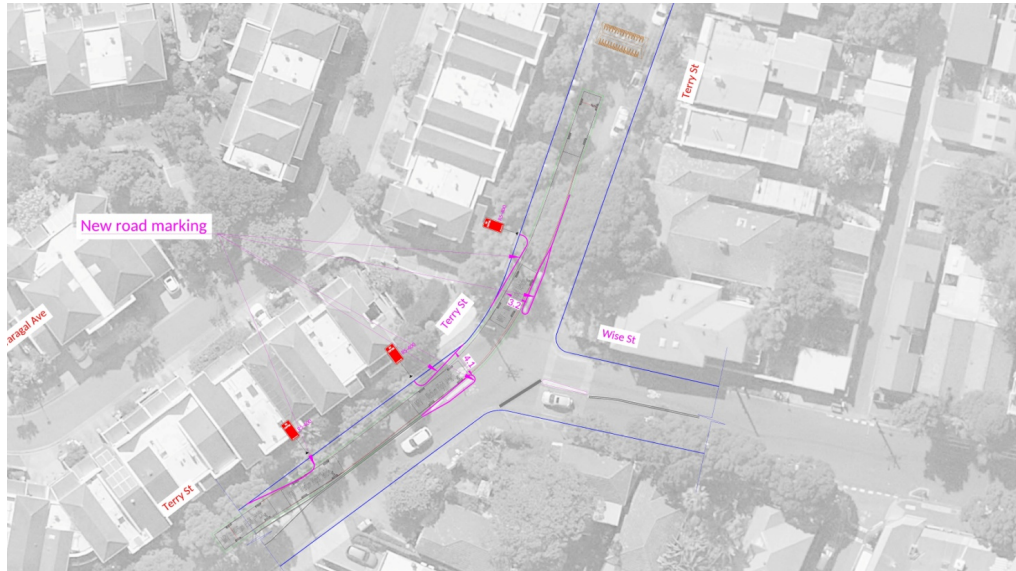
Proposed line marking on Terry Street near Wise Street
